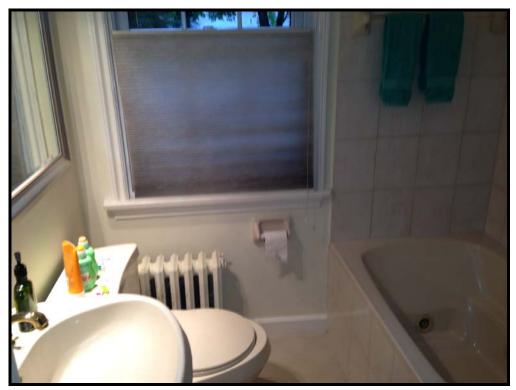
INTERIOR PHOTO - Main floor, bathroom.
